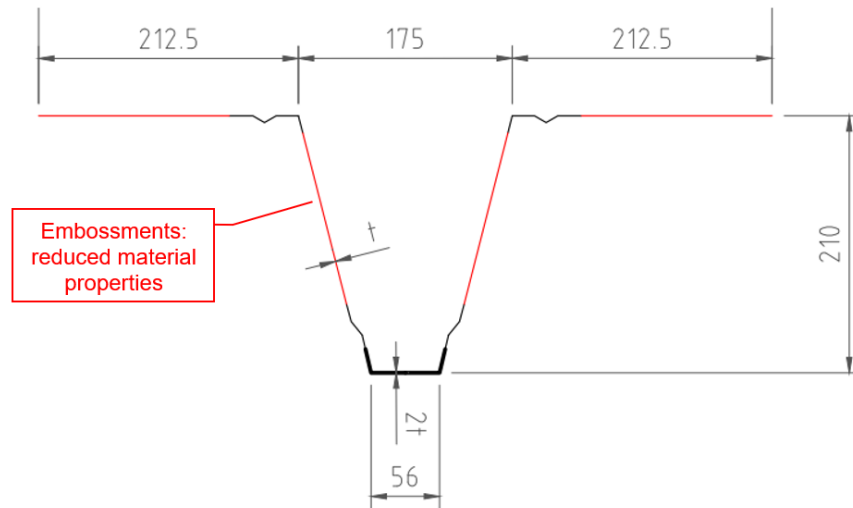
Cross-section steel deck as used in the FEA (unit: mm)
